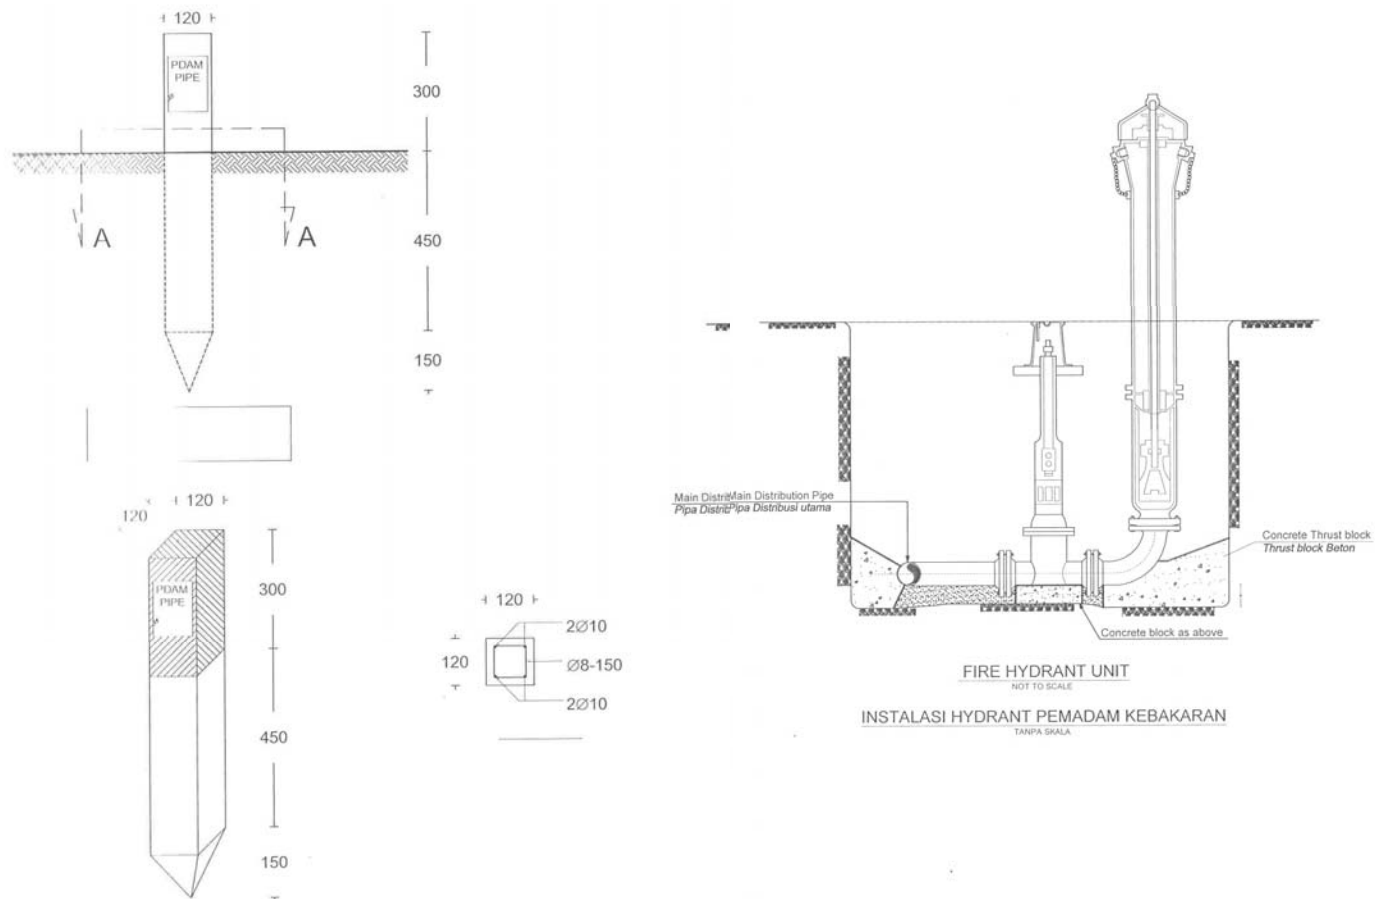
Fire Hydrant and Pipe Marking Post
